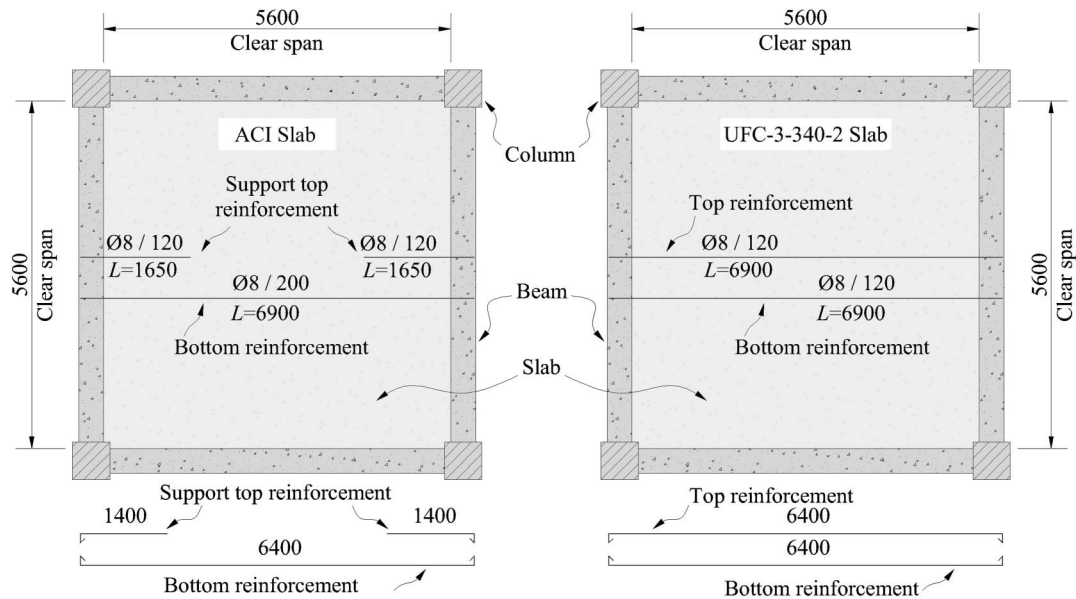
Reinforcement details of the ACI and UFC slabs (all dimensions in millimeters)
